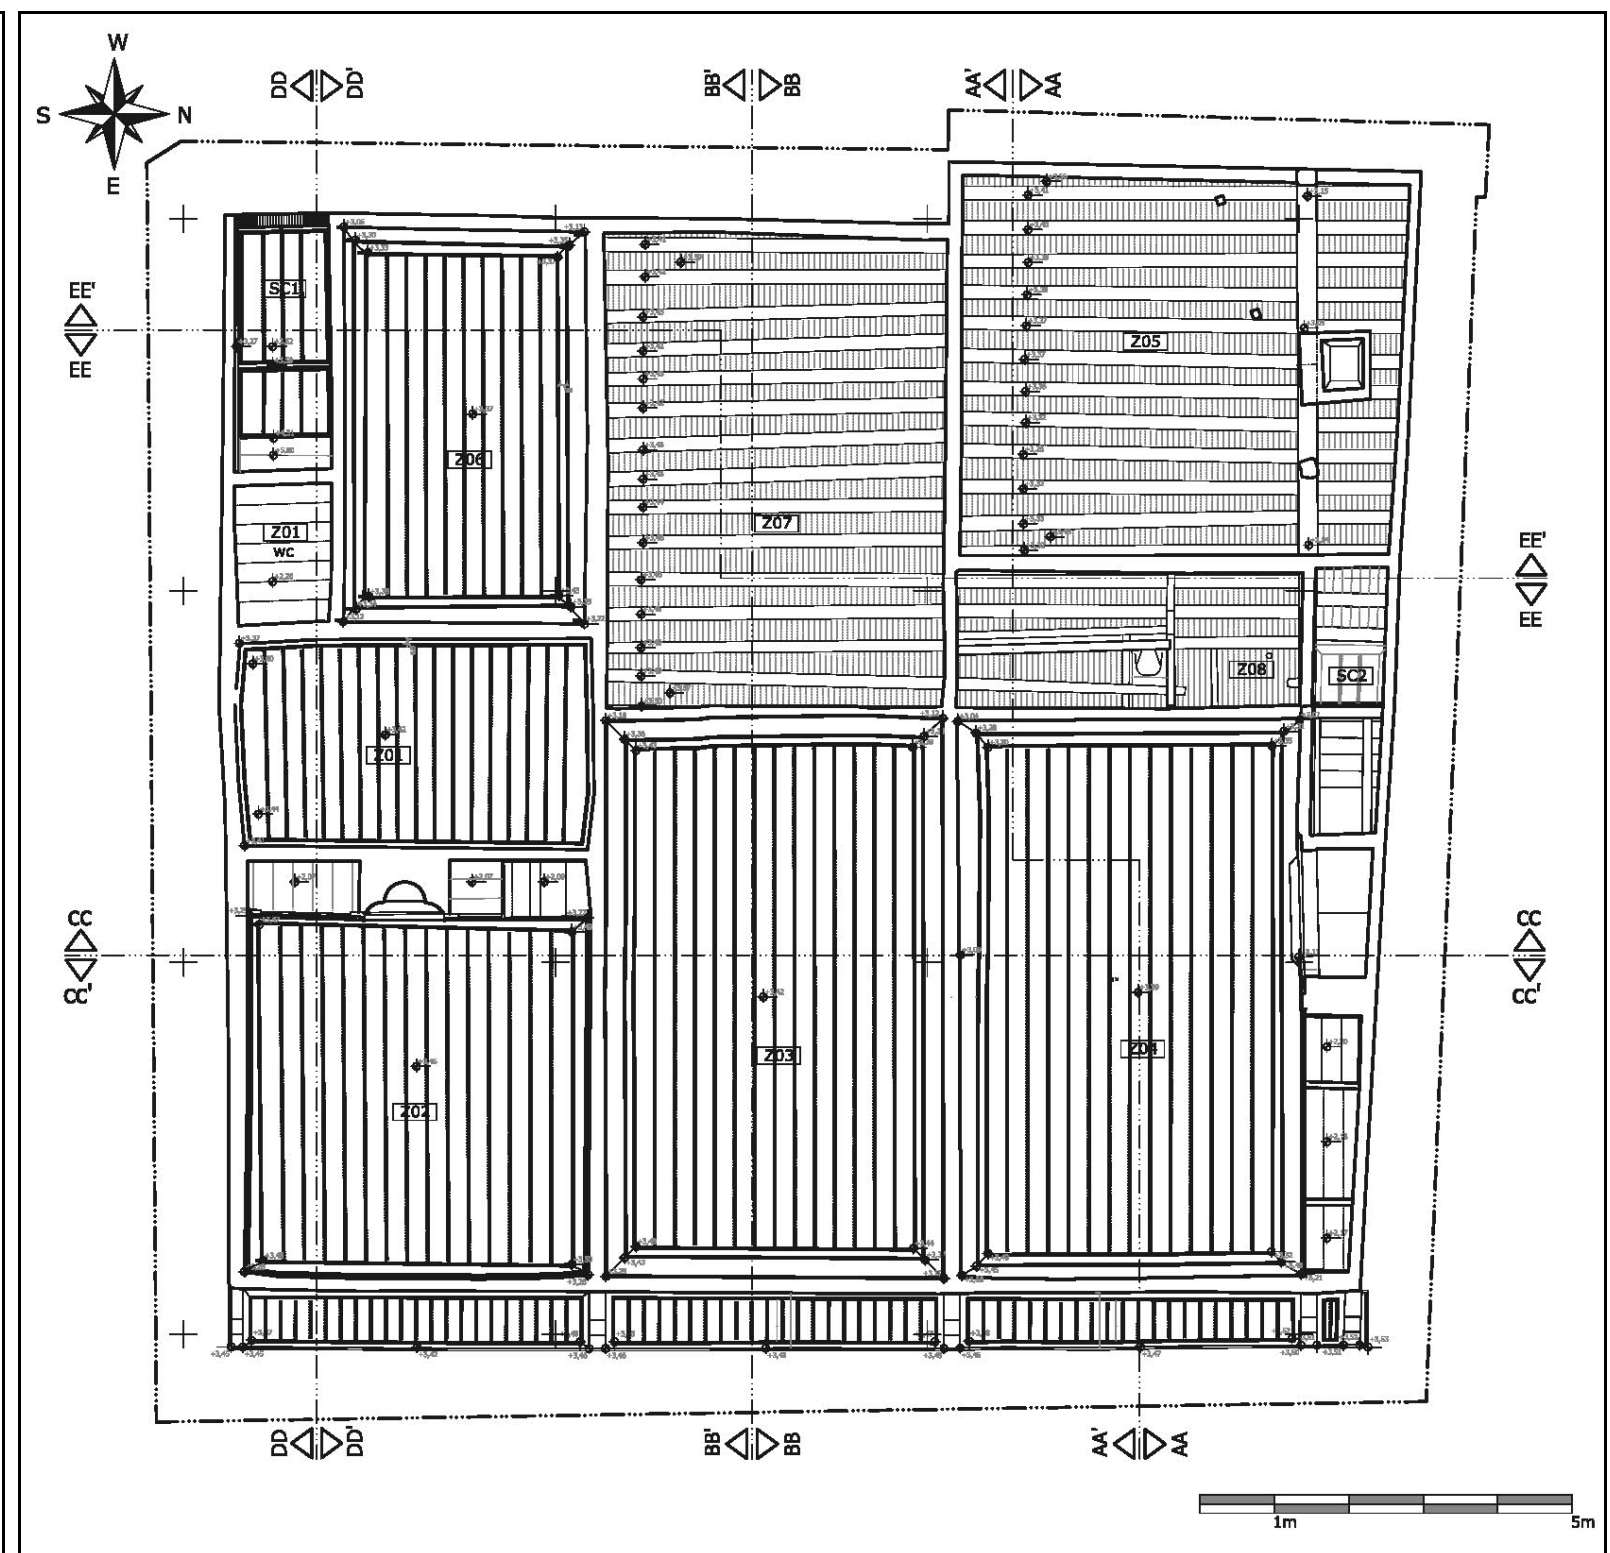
Ground Floor Reflected Ceiling Plan: 1/100 (presented in 1/50 at Jury)
